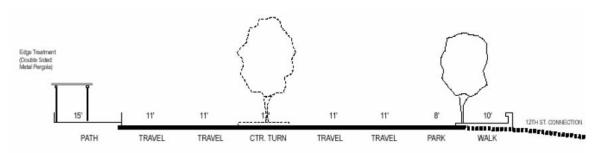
Cross-Section 100 Feet South of 12th Street, Looking North
